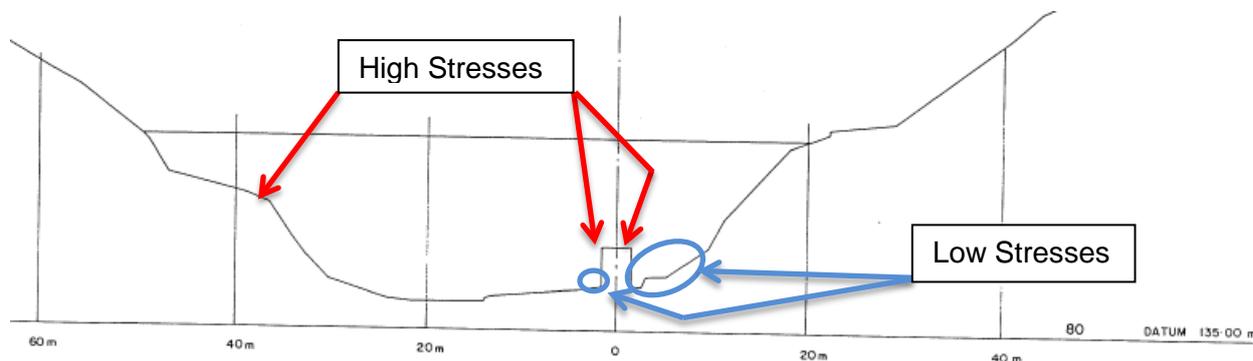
Areas of High and Low Stresses along Maitai Dam Foundation, Section 80
